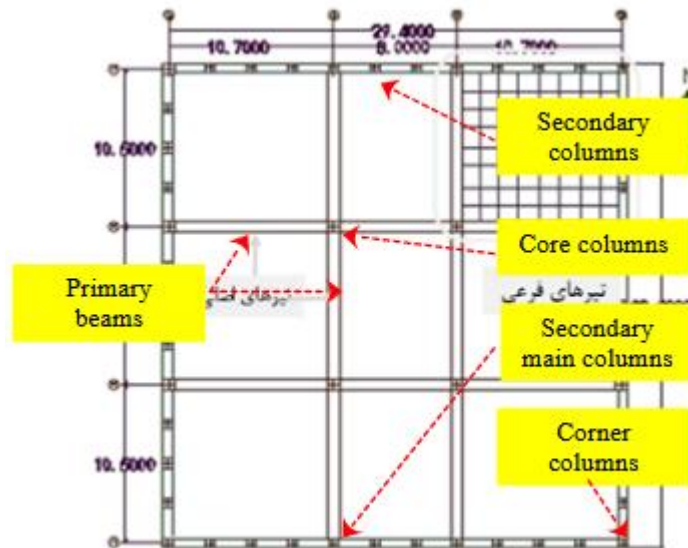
Reconstructed layout of the tower showing the location and spacing of columns (Govt. of Iran (2017)).
